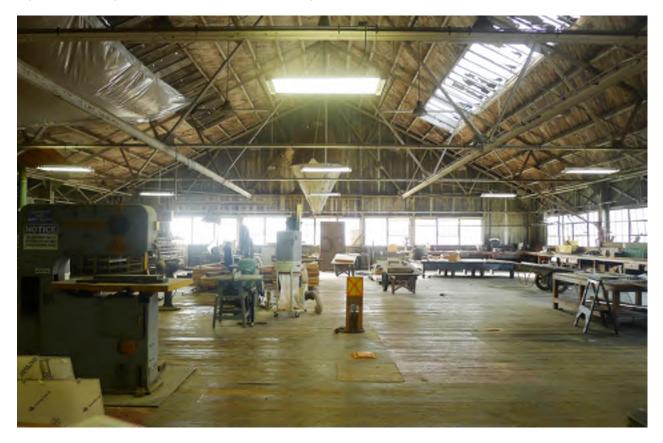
Building 108: Second floor, interior view looking south, west side.
